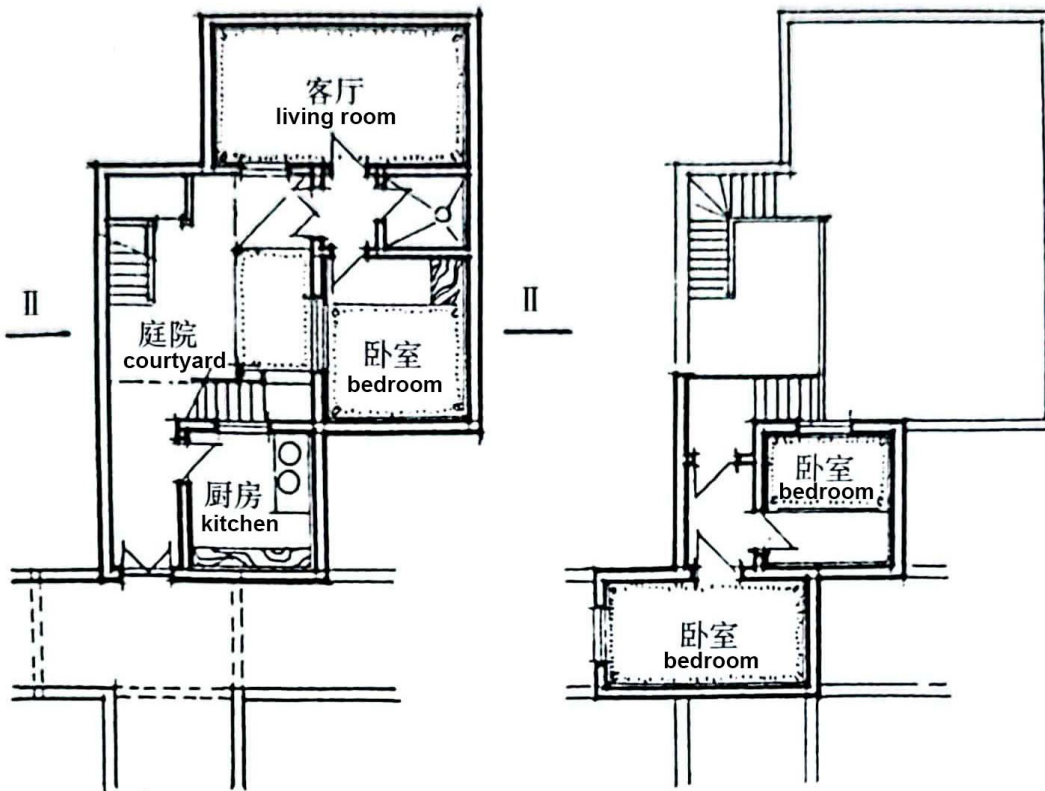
(left) Floor plans of the same house in Buyibaheqi, Ustang: ground floor and courtyard; (right) second floor and rooftop garden. On the second floor, a bedroom is built overhanging above the public pathway to increase living space.²⁹ Translated by author.
